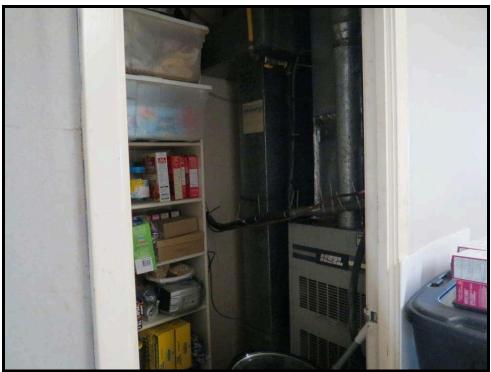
Furnace Room (Photo taken on June 13, 2018; Facing Southeast)
